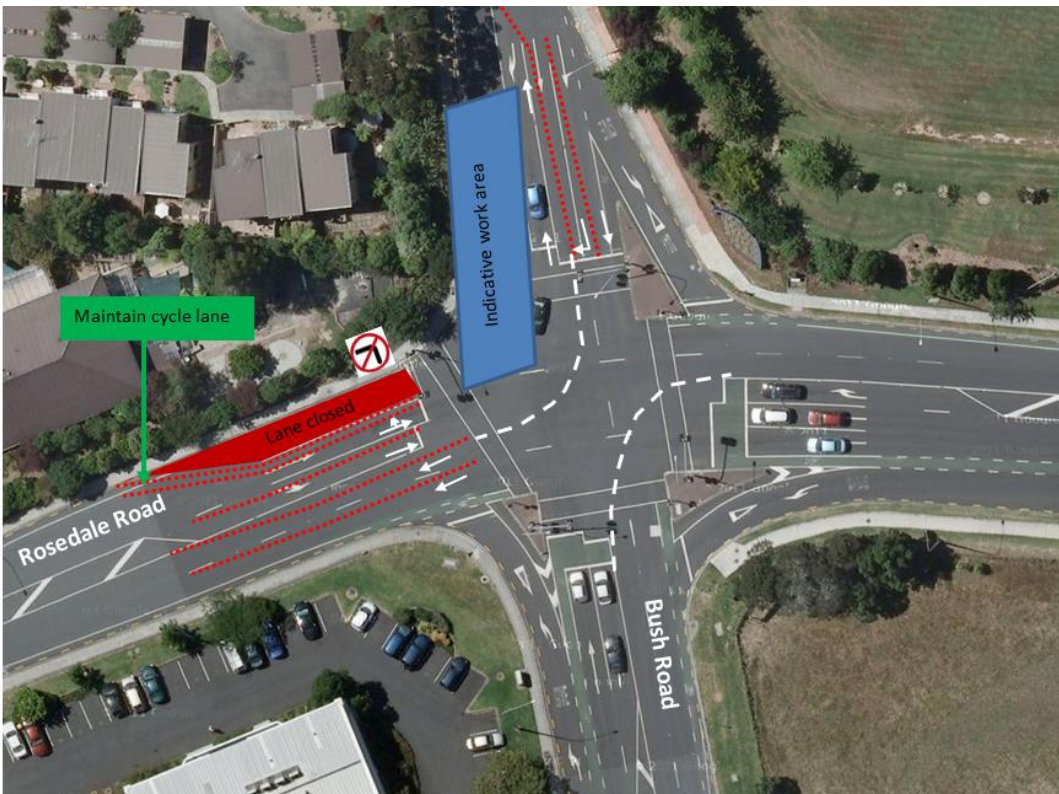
Rosedale Road/Bush Road - Possible Stage 2 layout
